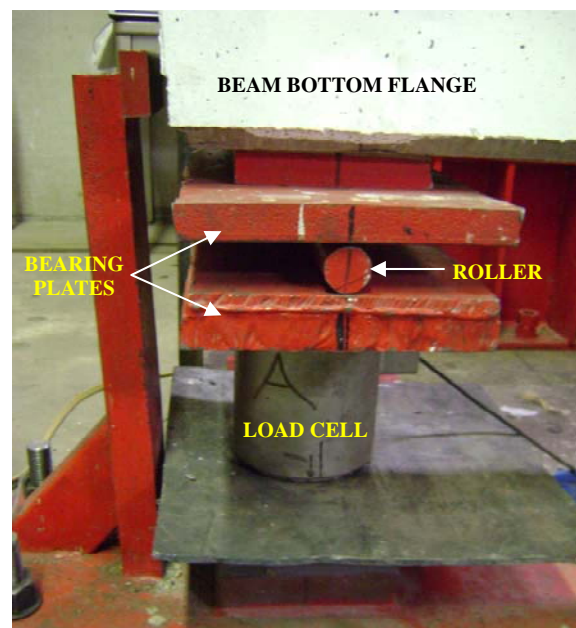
Steel Roller-Bearing Plate Assembly used to Support Beams
